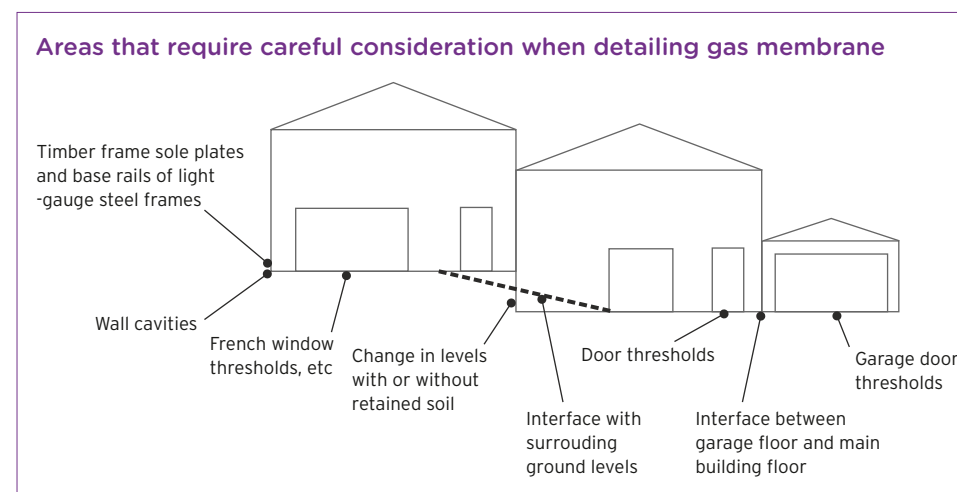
Issues when detailing gas membranes into low rise house construction
